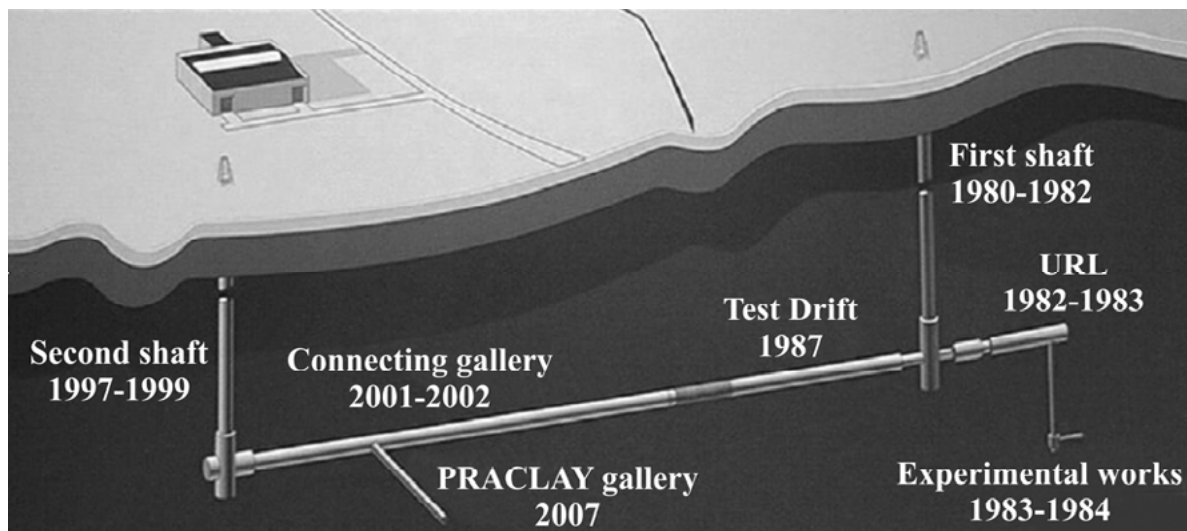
Location of the connecting gallery at HADES Underground Research Laboratory
